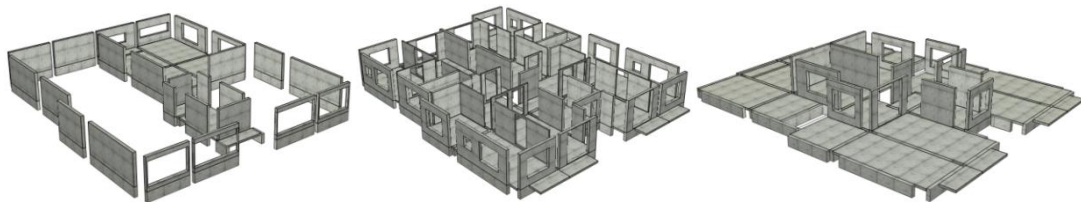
3D Locations of Infill Walls on a) 2<sup>nd</sup> Floor, b) Normal Floor, c) 8<sup>th</sup> Floor Beams
